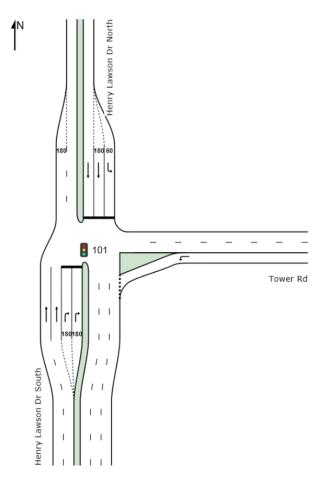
Henry Lawson Drive and Tower Road intersection Option 4
